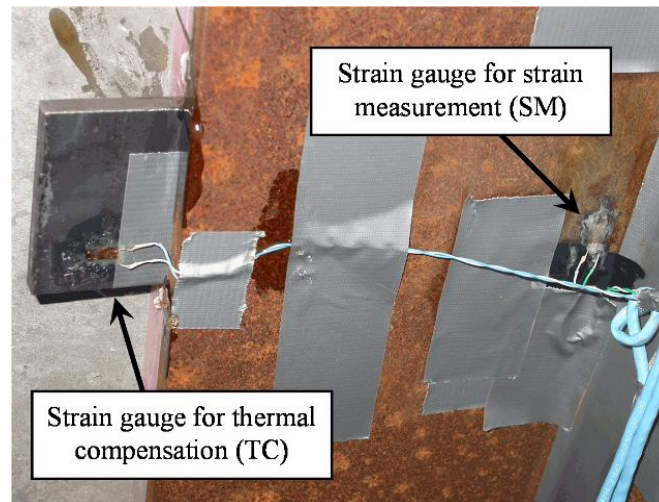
Close-up of strain gauges installed on top flange of Girder 1
